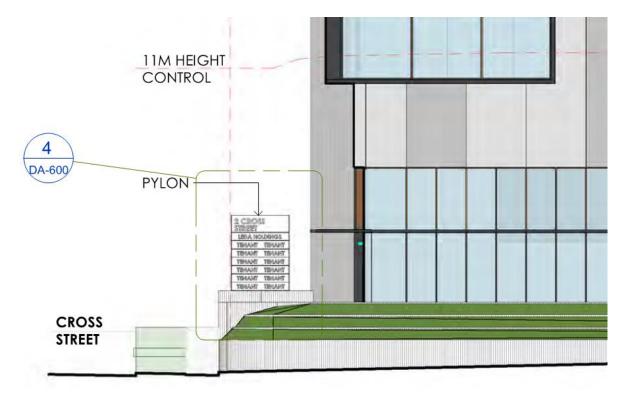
East elevation extract showing free standing sign (Source: Pace Architects)
